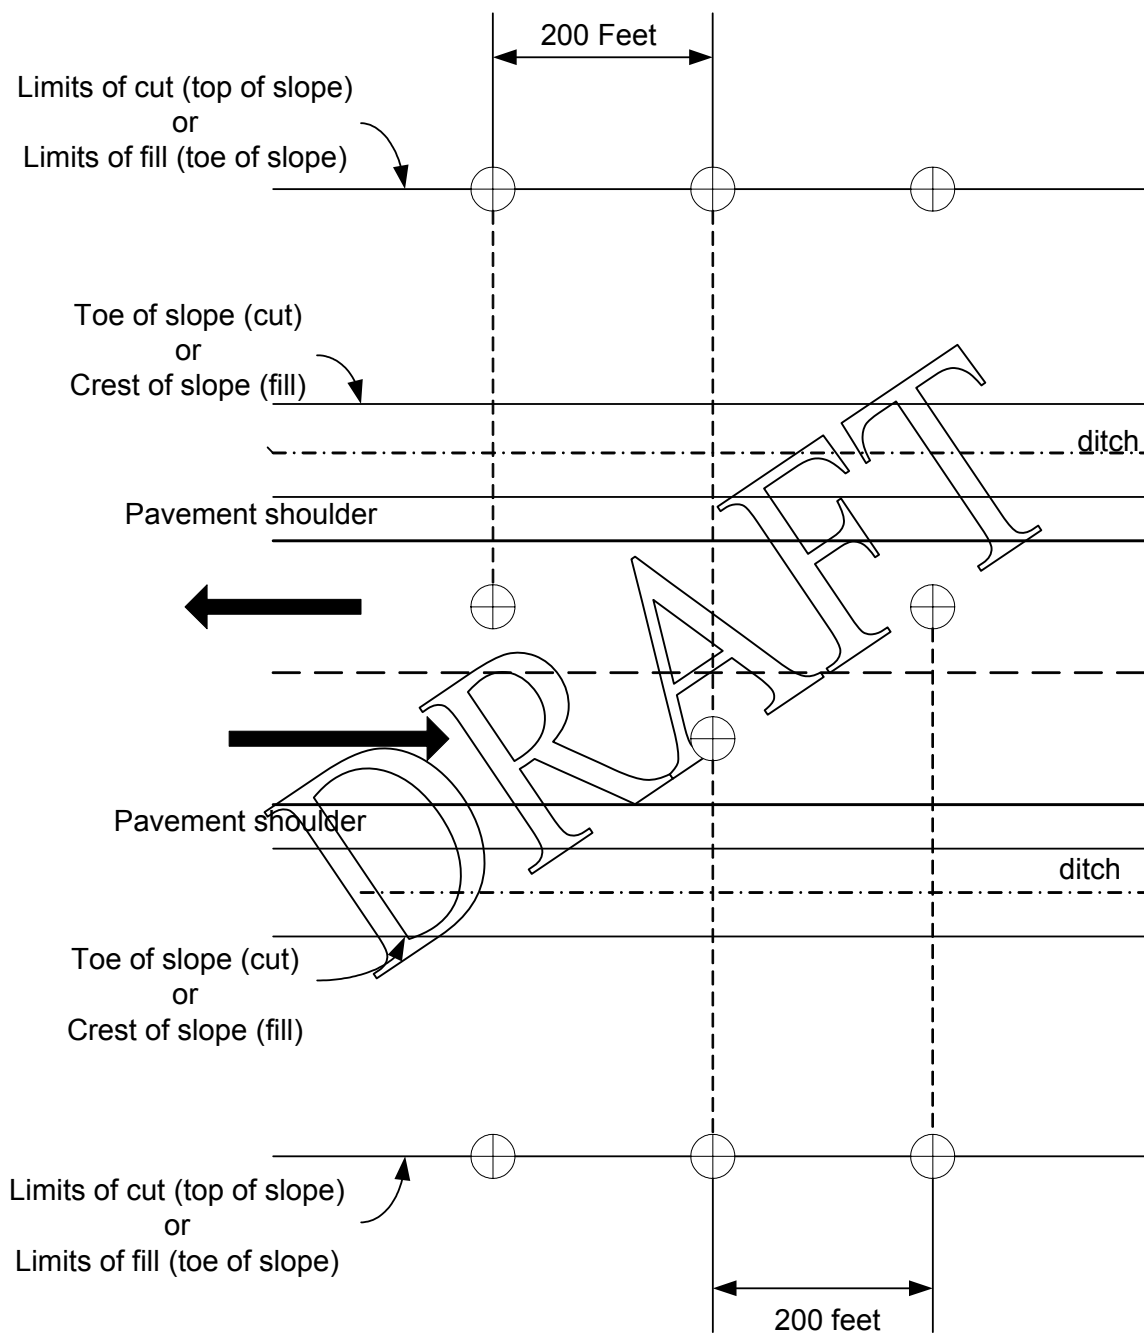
Boring Layout for a Two (2) Lane Road with Cut or Fill Slopes Equal to or Greater than 15 ft High or Area Where Rock is Expected to be Encountered above the Planned Depths of Excavation
